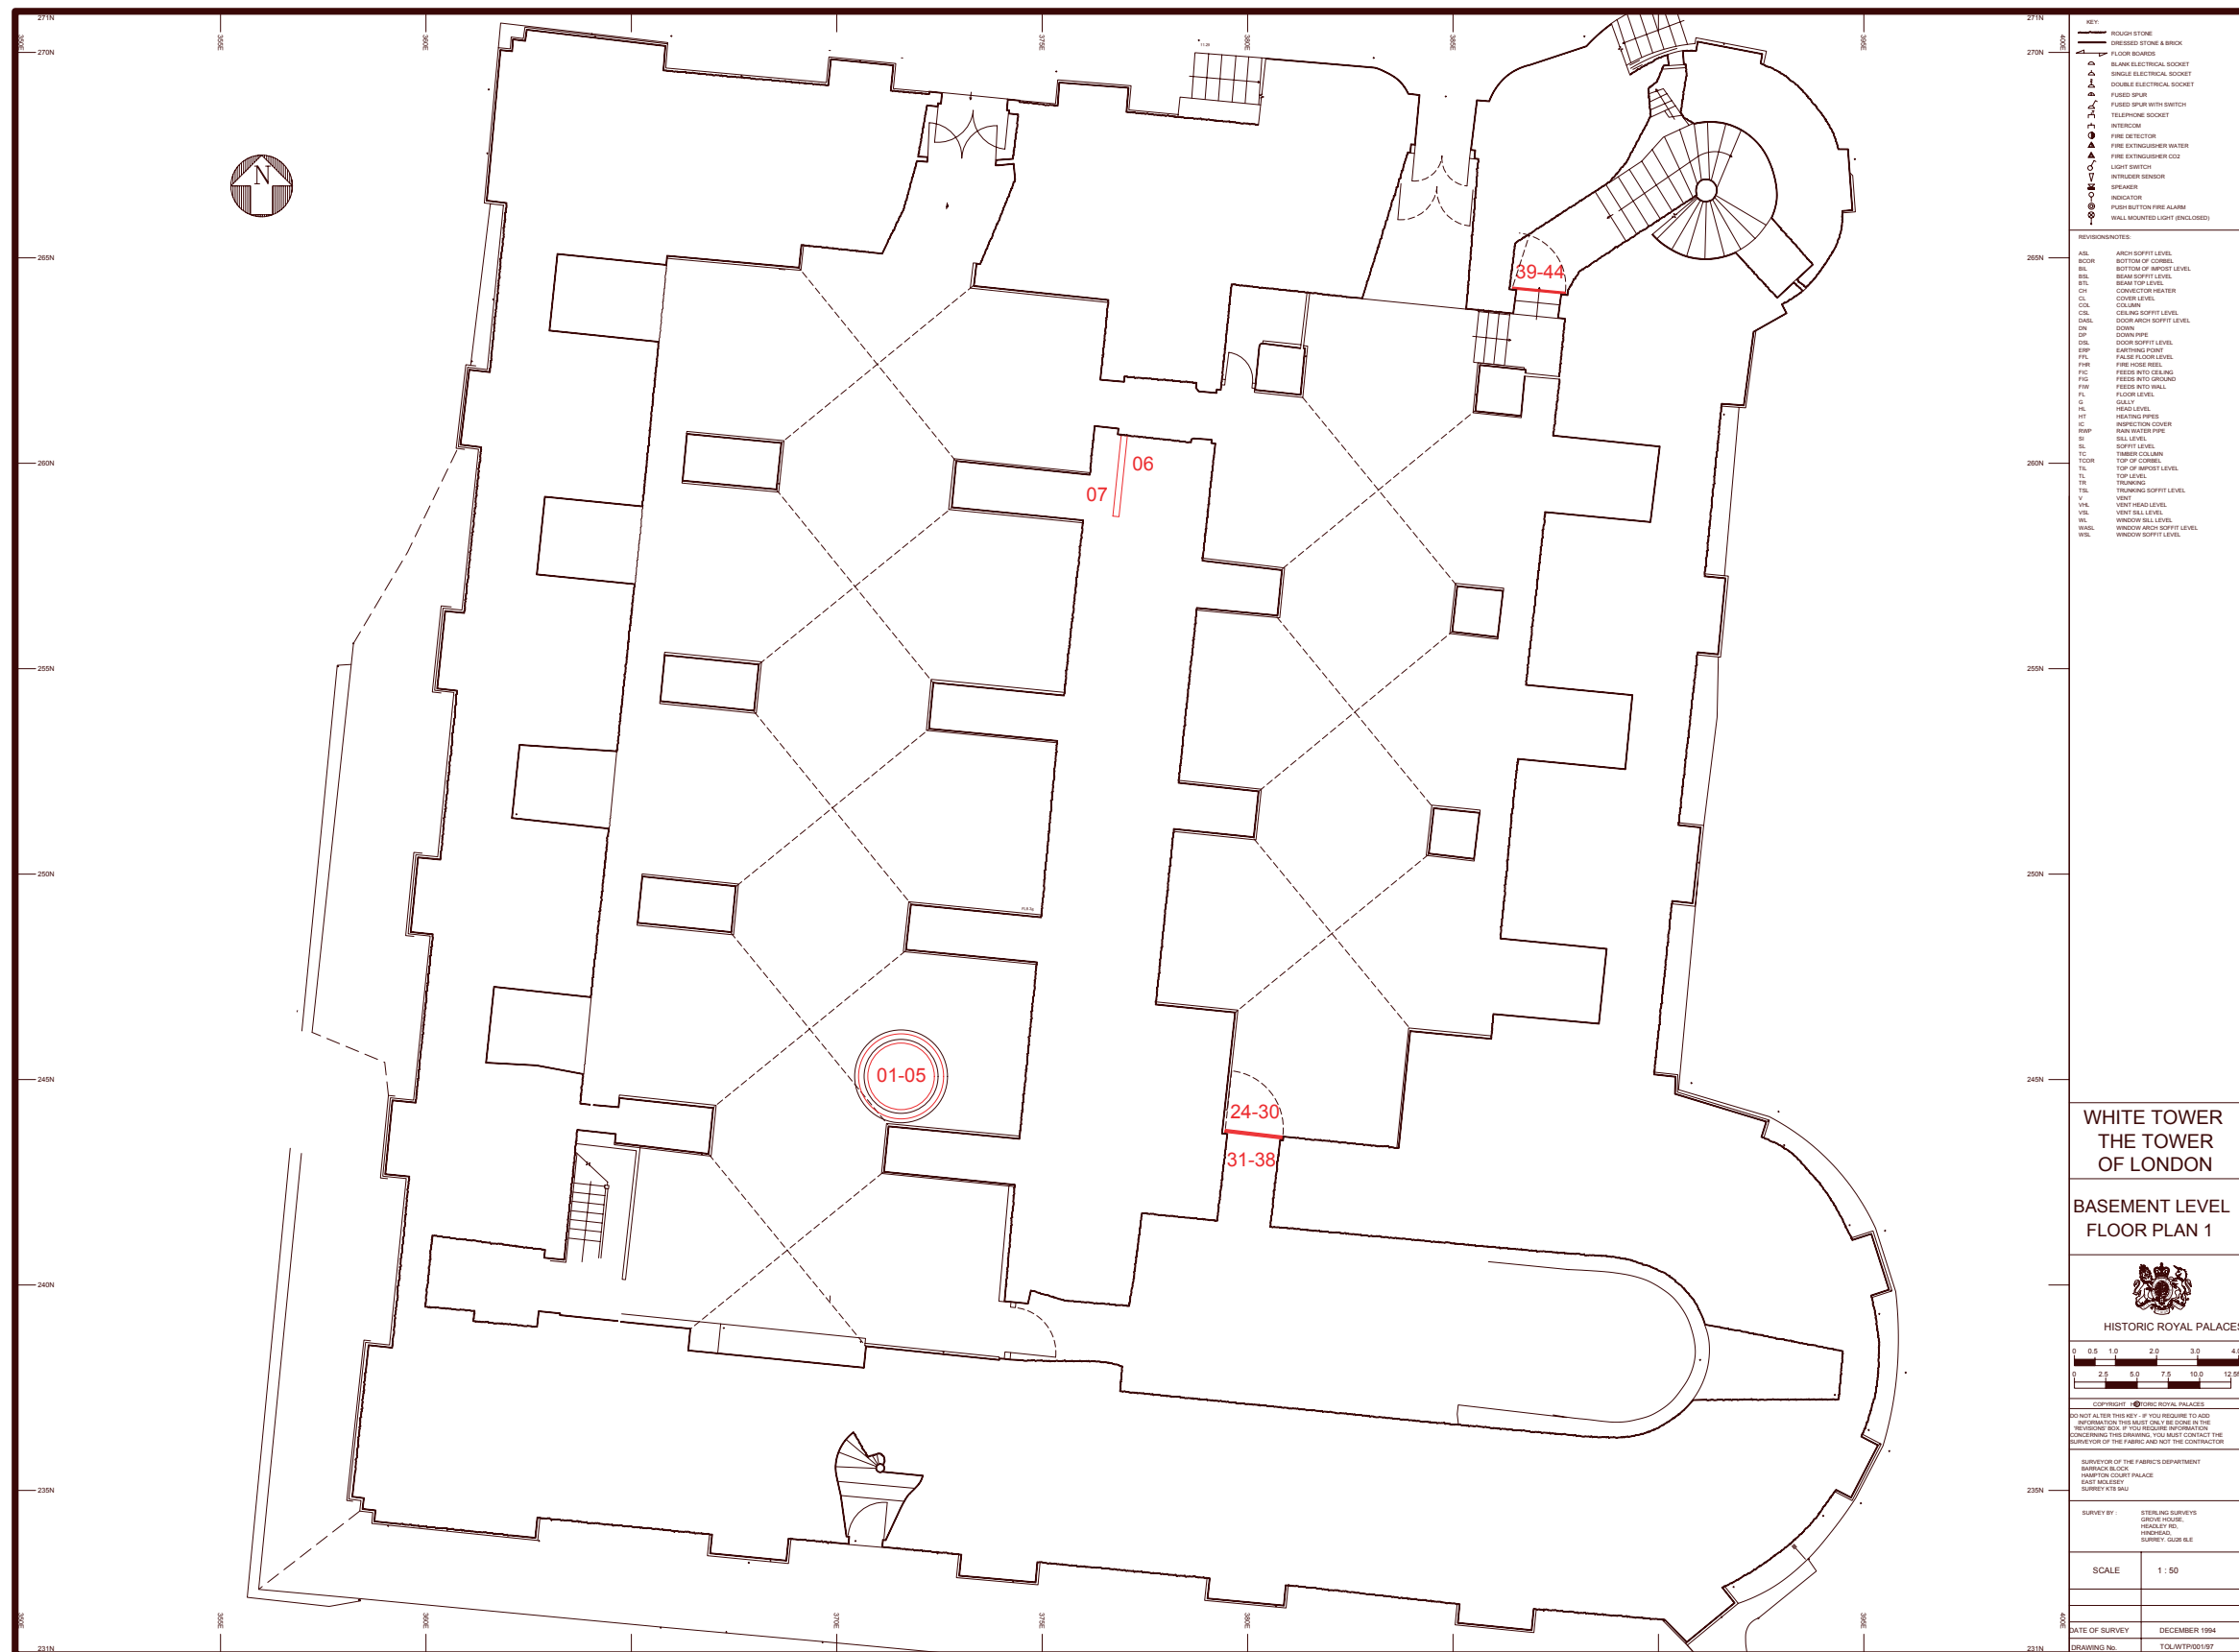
Plan of basement level showing locations of timbers sampled (after Historic Royal Palaces)
